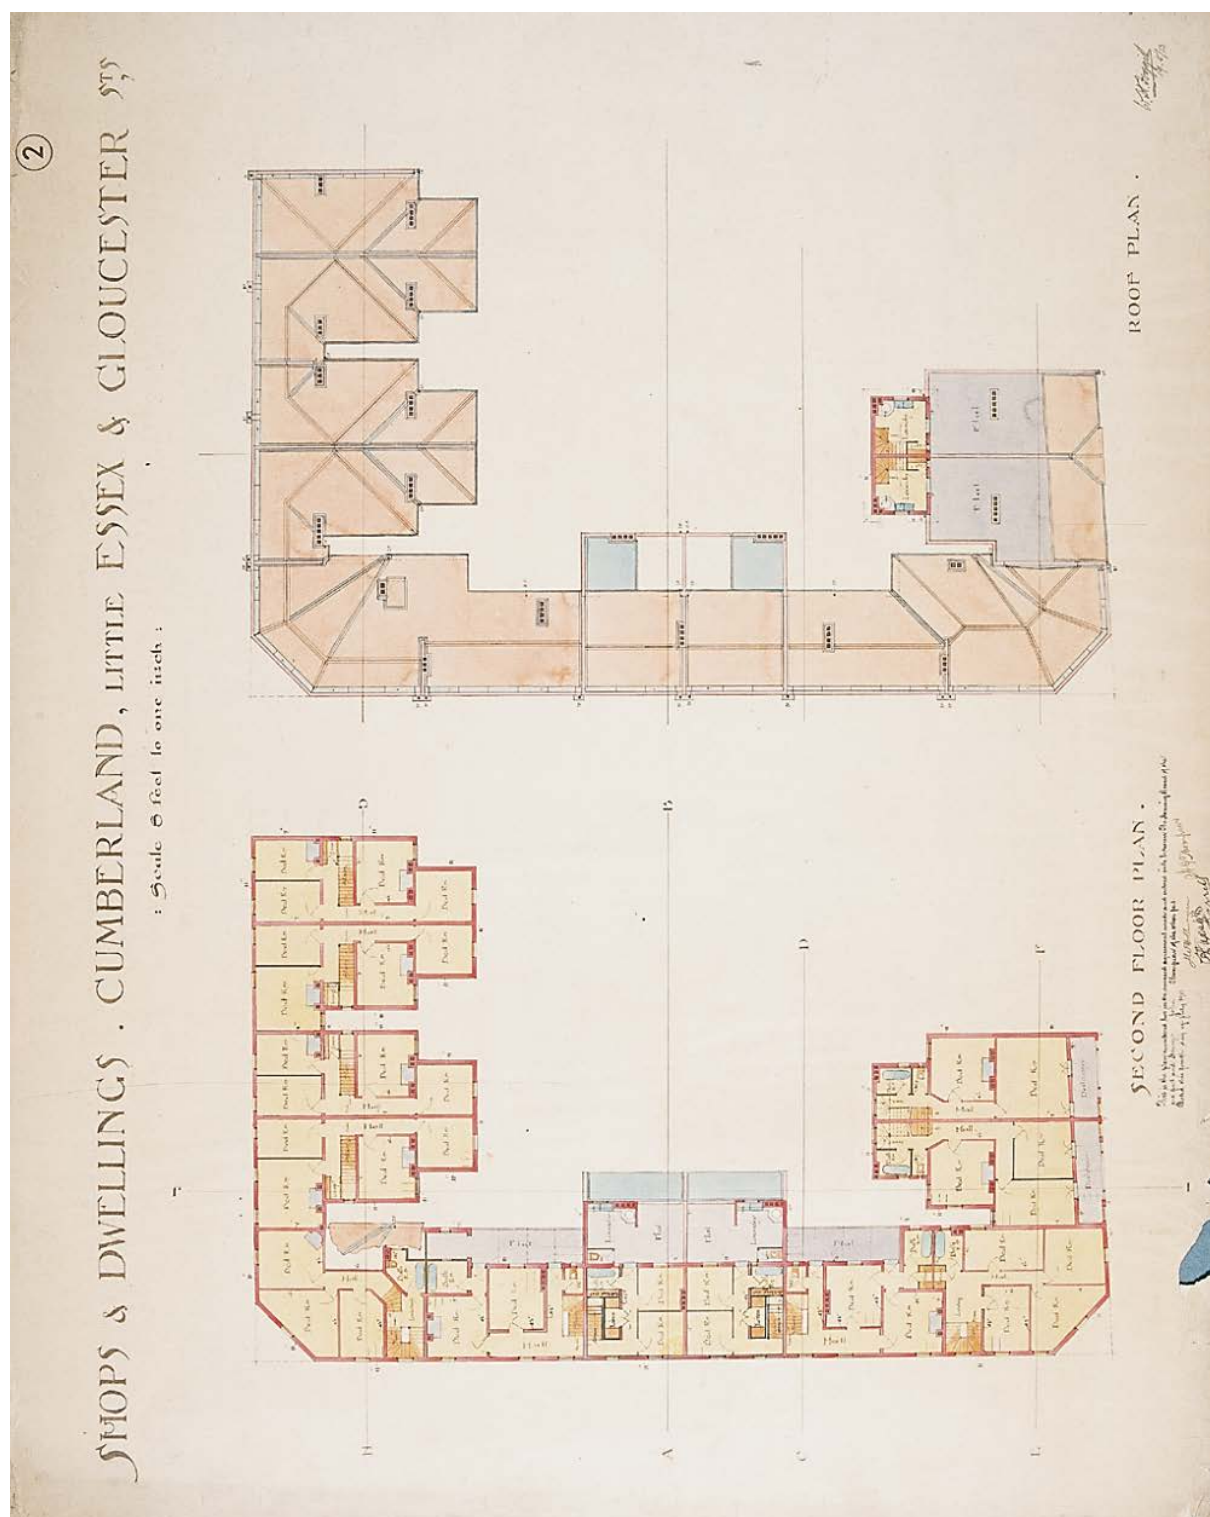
9 2nd and Roof plans for Shops & Dwellings, Cumberland, Little Essex & Gloucester Streets, The Rocks, Housing Board, Architect Foggitt dated May 1913. Source: State Records NSW, Plan No. 3133.
